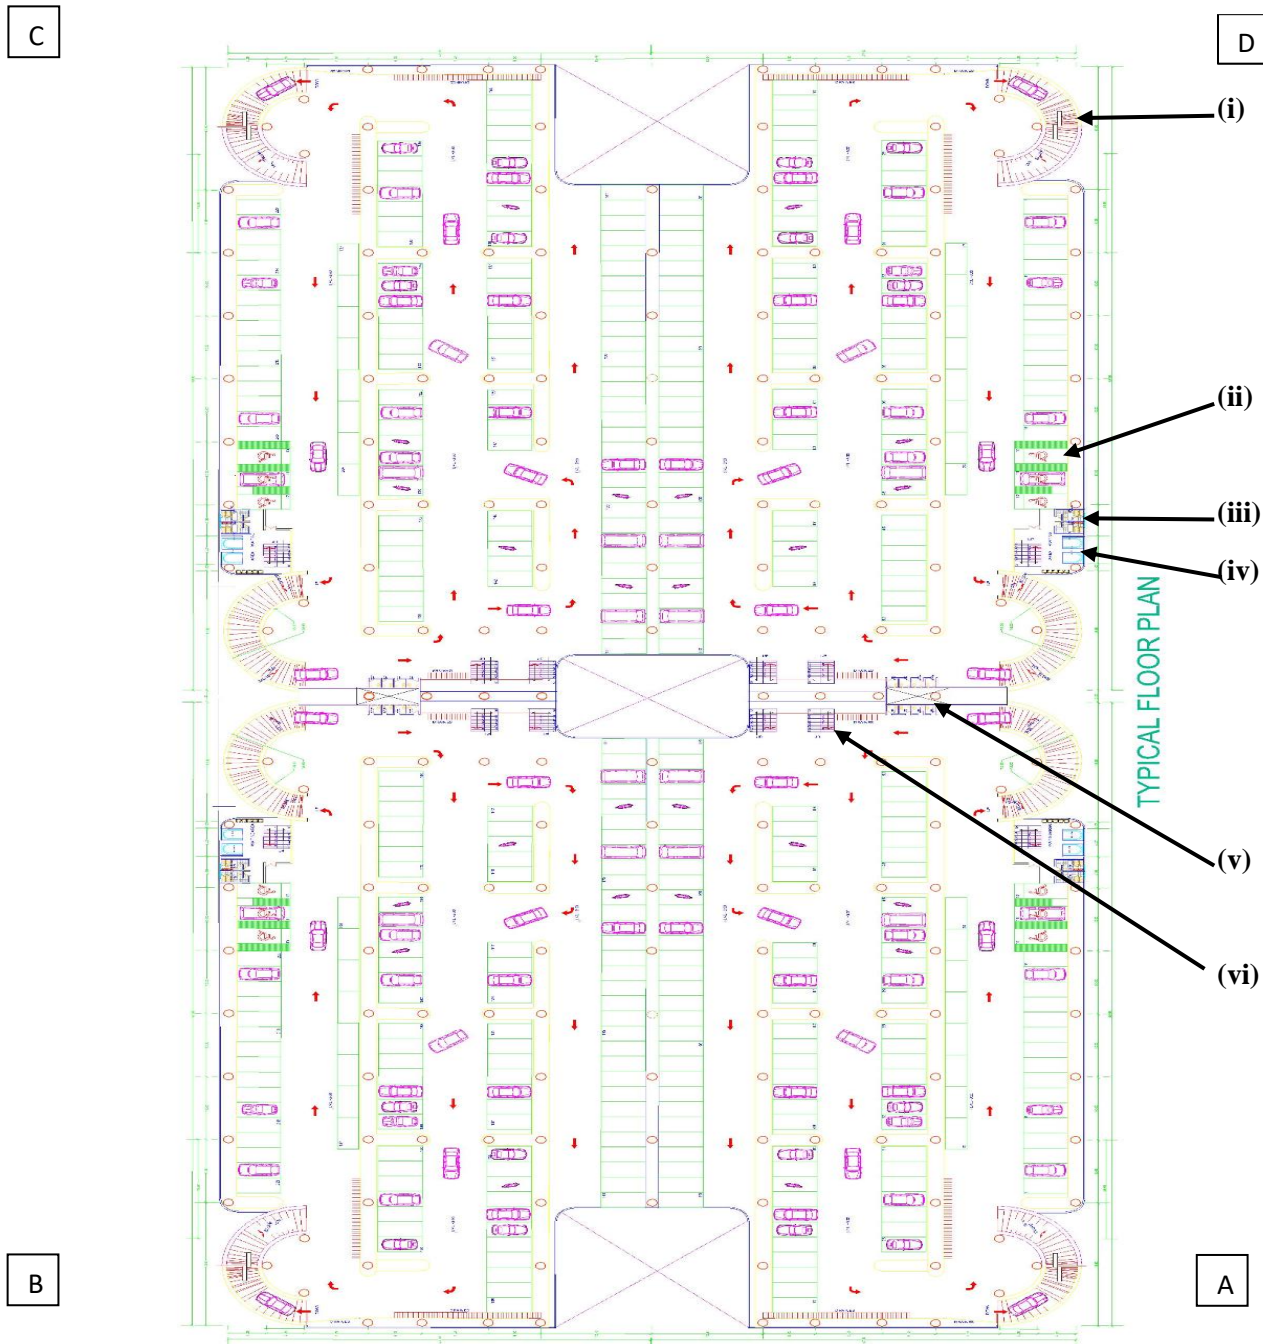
Typical Floor Plan, (i)Ramp, (ii)Disabled parking, (iii)Washrooms, (iv)Elevators, (v) Washrooms, (vi)Staircases
